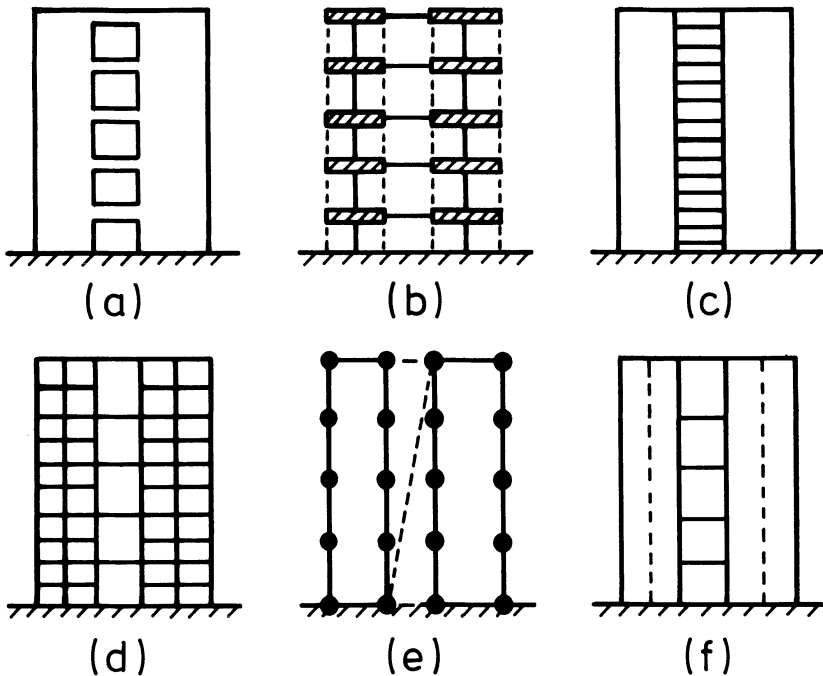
Coupled wall structure (a) represented by: (b) wide-column frame analogy, (c) continuous medium, (d) finite elements, (e) higher order finite elements, (f) finite strips
